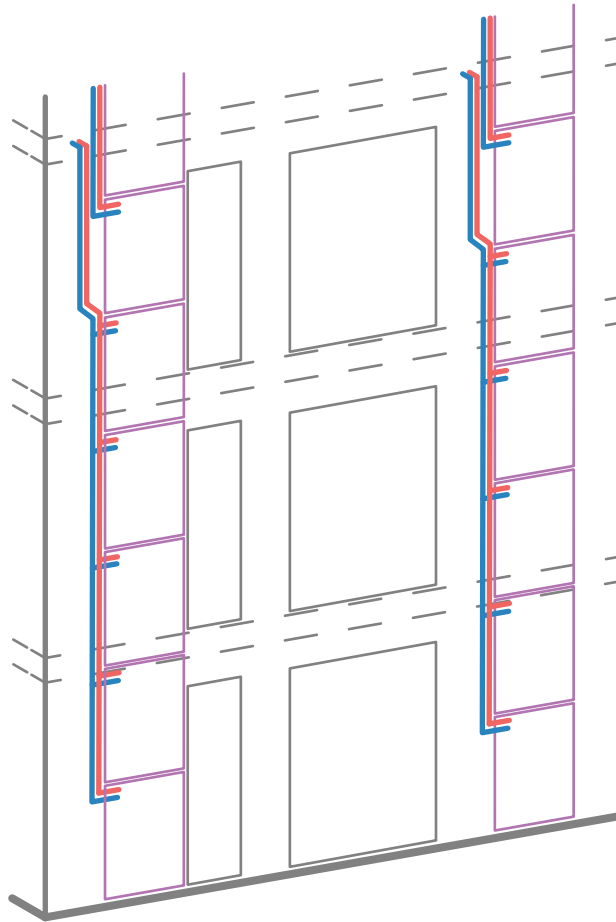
Proposed piping system for vertically arranged facade-integrated PVT collectors (own illustration).
